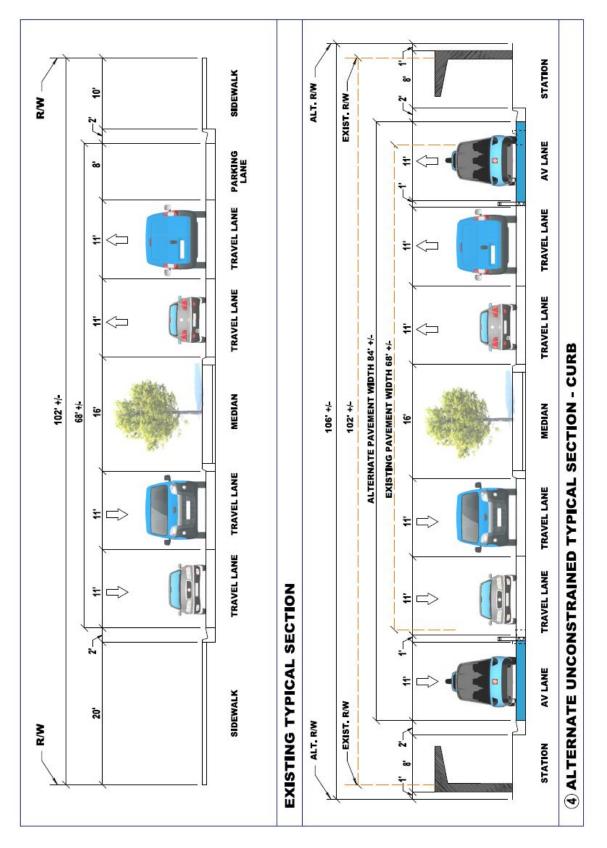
North Corridor Existing and Alternate Unconstrained Typical Section with Curbside Station -Main Street
